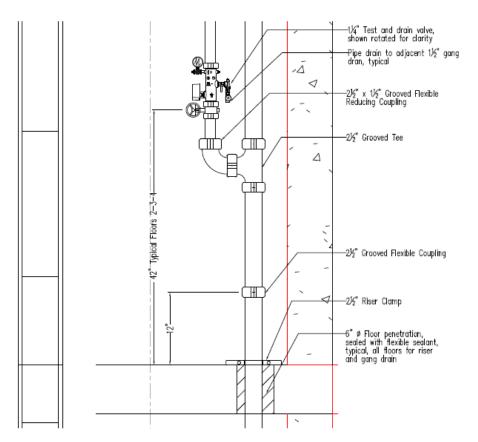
Floors 2, 3 and 4 control assembly detailed drawing (looking north)
